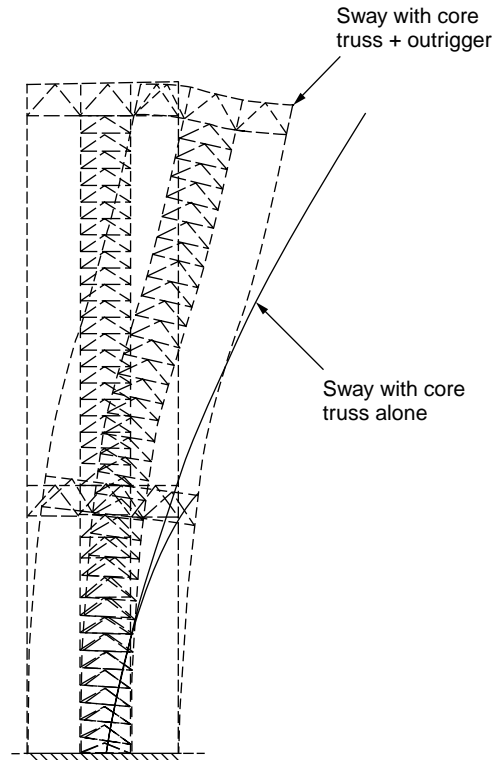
Improvement of lateral system using outrigger and belt trusses.
